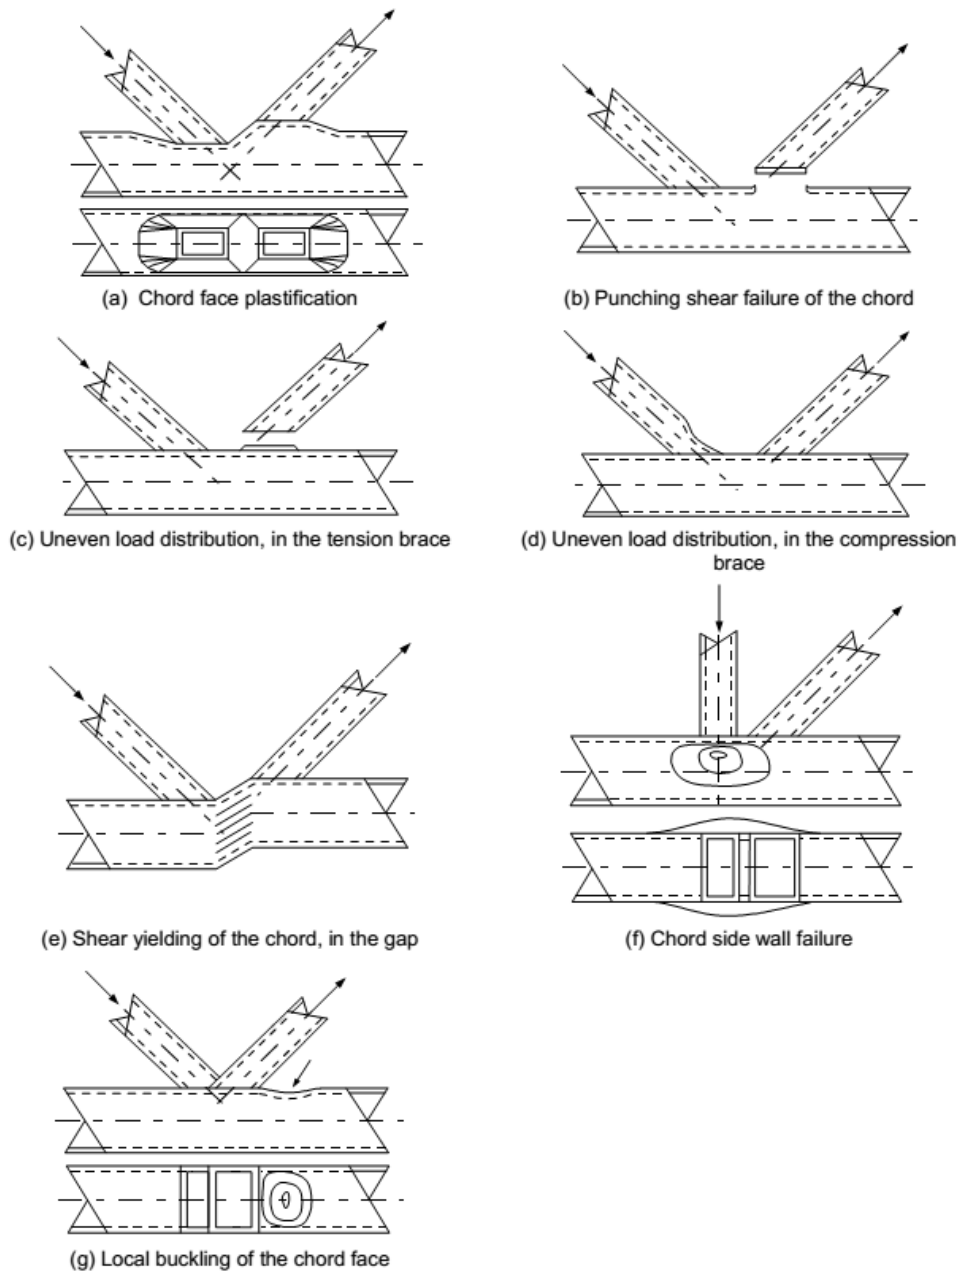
Failure types for K-type RHS truss joints. (Packer et al. 2009)
